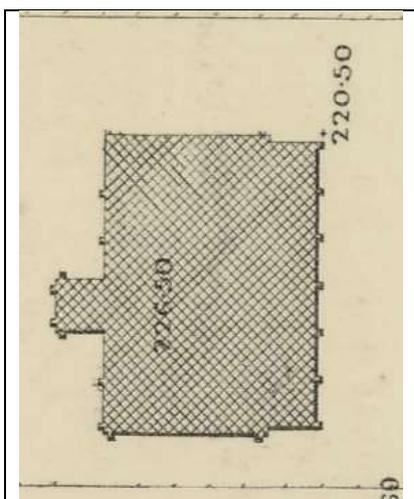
Footprint of Hall in 1926 (MMBW Detail Plan 2954).
